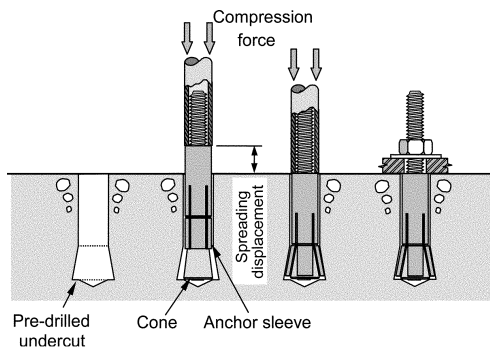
(b)—Type 2 undercut anchor. Displacement-controlled anchor set in predrilled undercut by hammering sleeve over cone.
